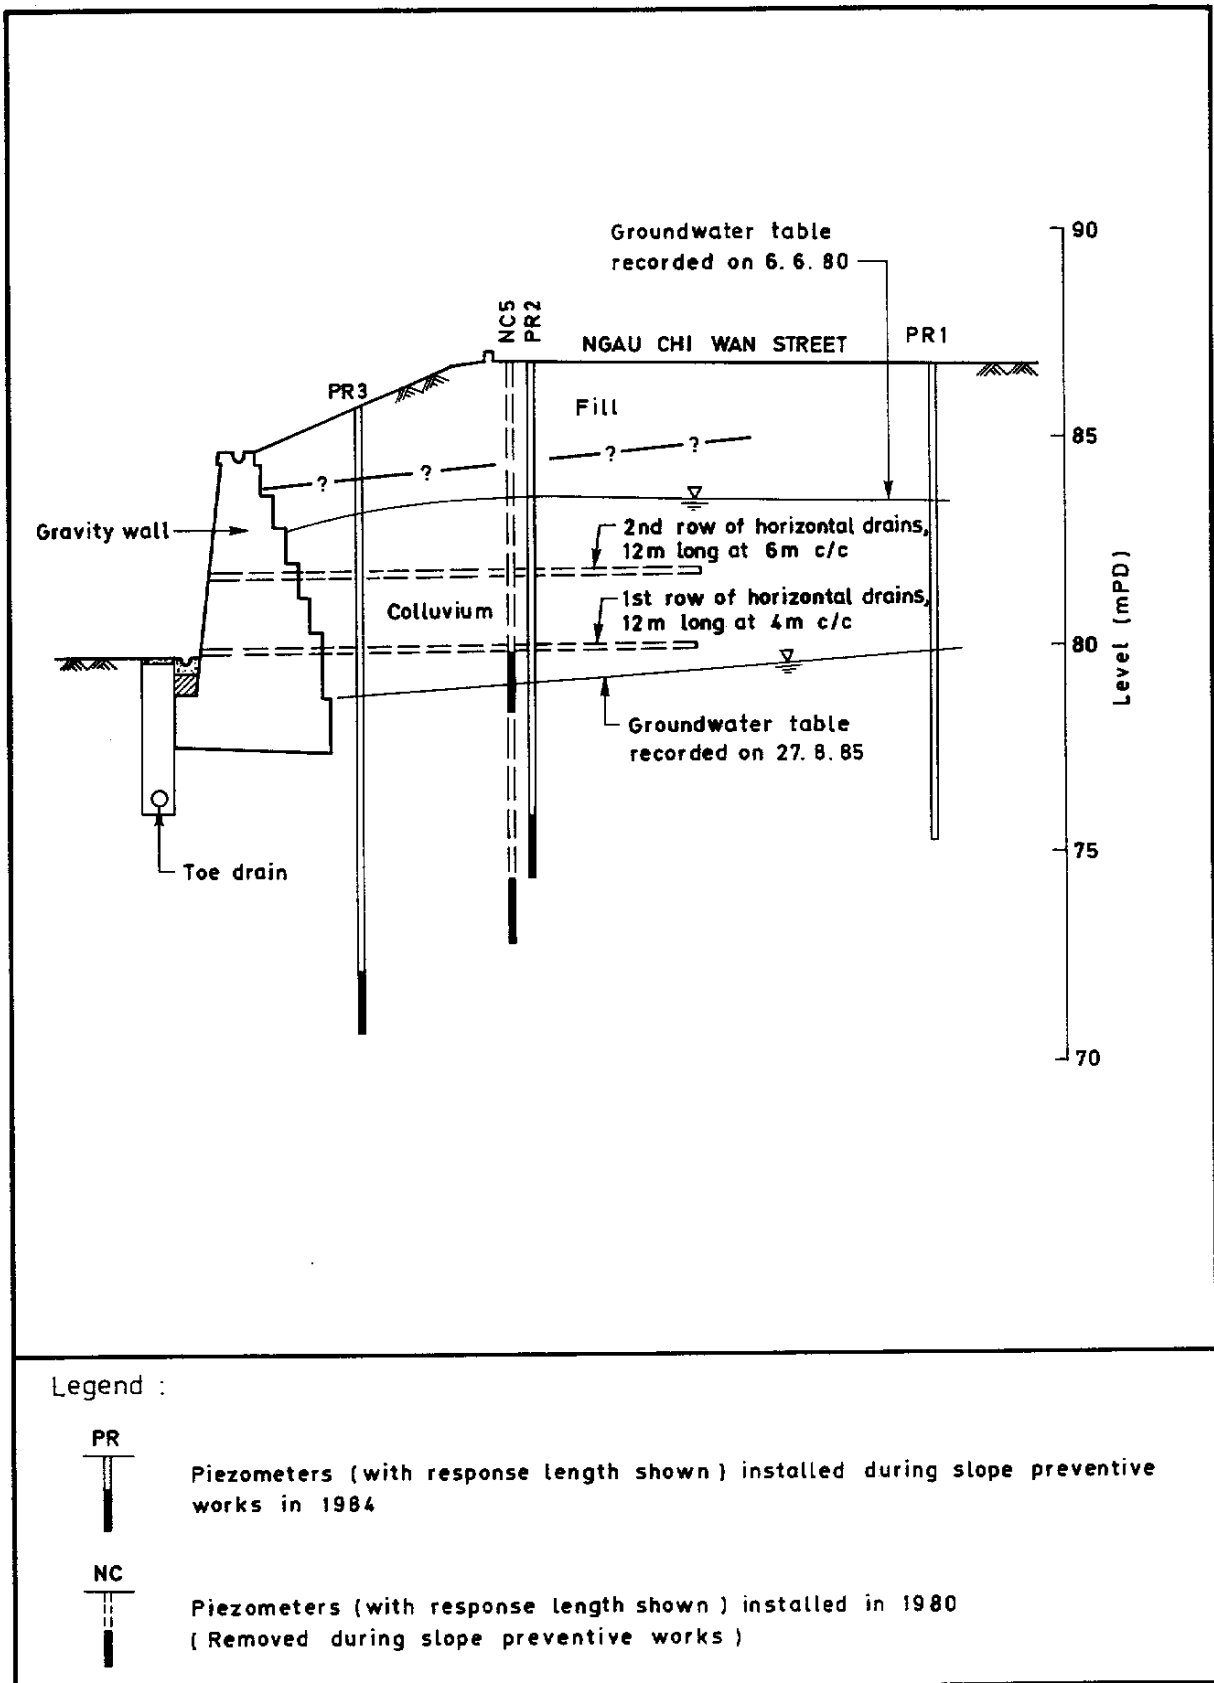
Typical Section Showing Ground Conditions and Positions of Horizontal Drains at Slope 11NE-A/CR57, Choi Wan Estate (after Fugro, 1986)
